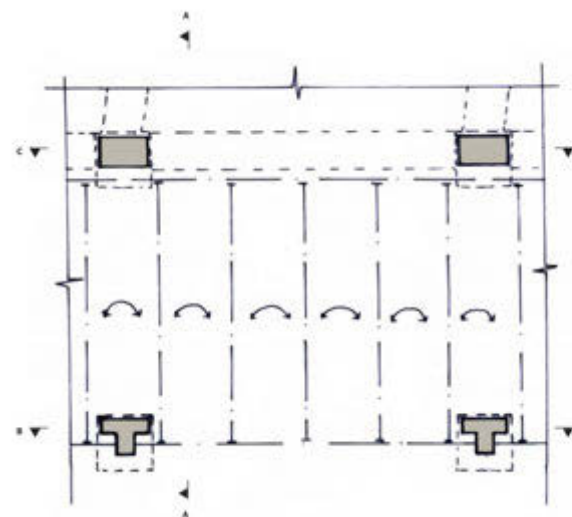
[Left] Sketch showing existing jack arch deck with proposed new support locations for new deck
